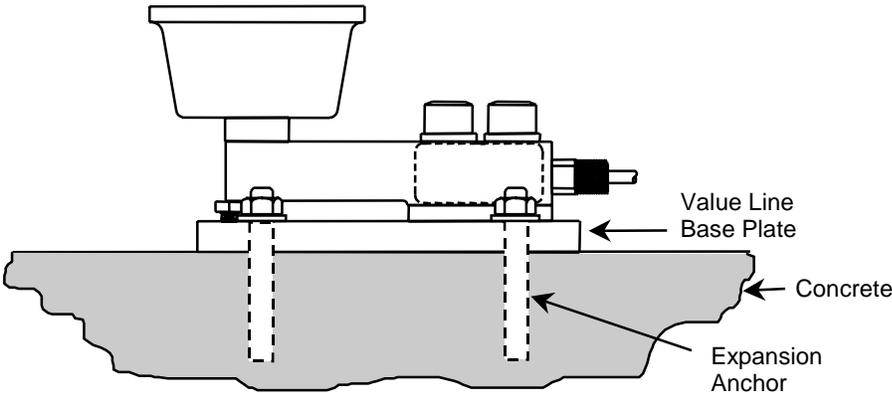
Base Plate Bolted to Level Concrete Floor
